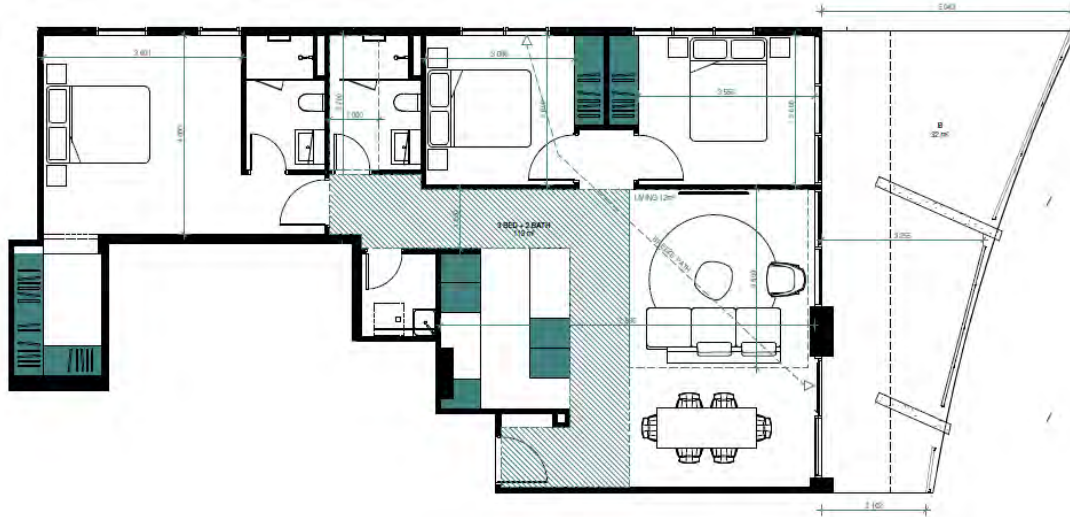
Dwelling Type T01 (source: application plans prepared by Plus Architecture)
